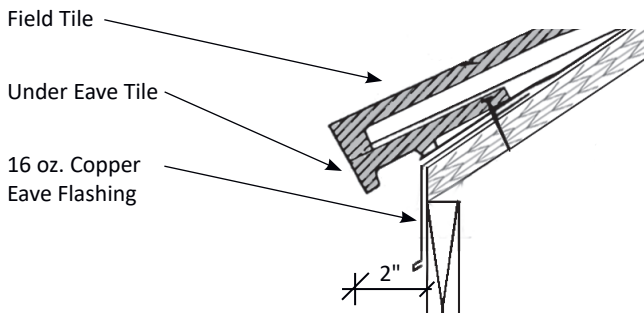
Flat Interlocking Eave Detail With Under Eave
